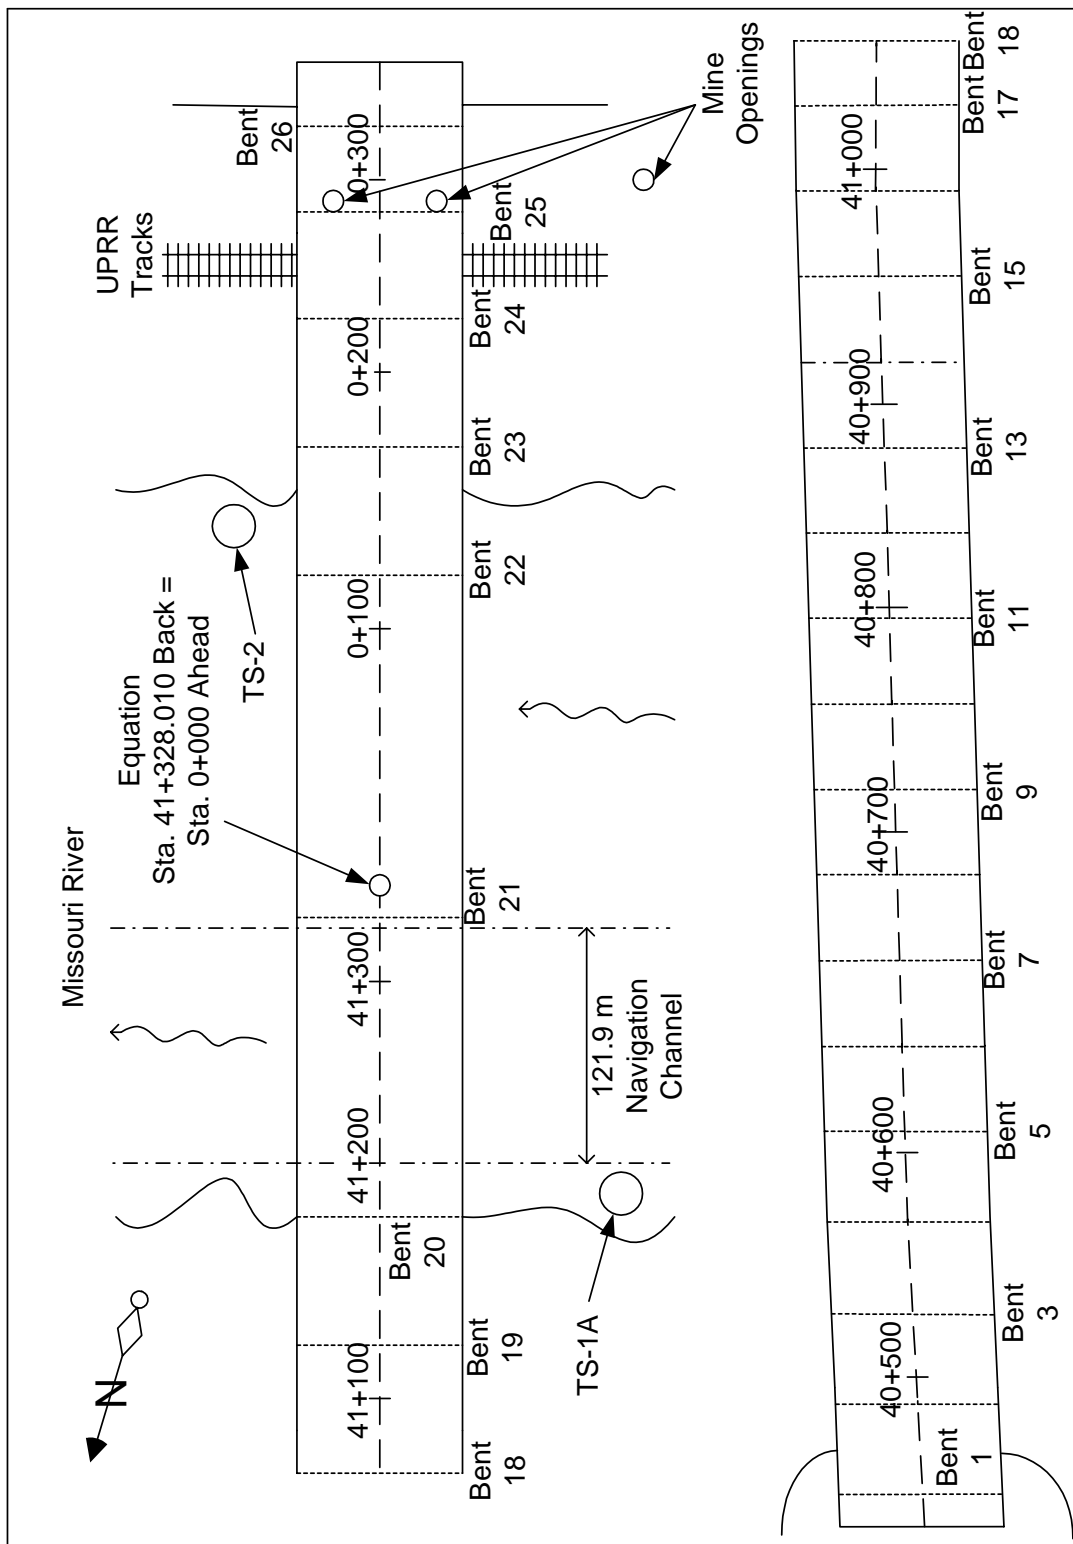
Plan view of Lexington bridge showing locations of bridge bents and test shafts
